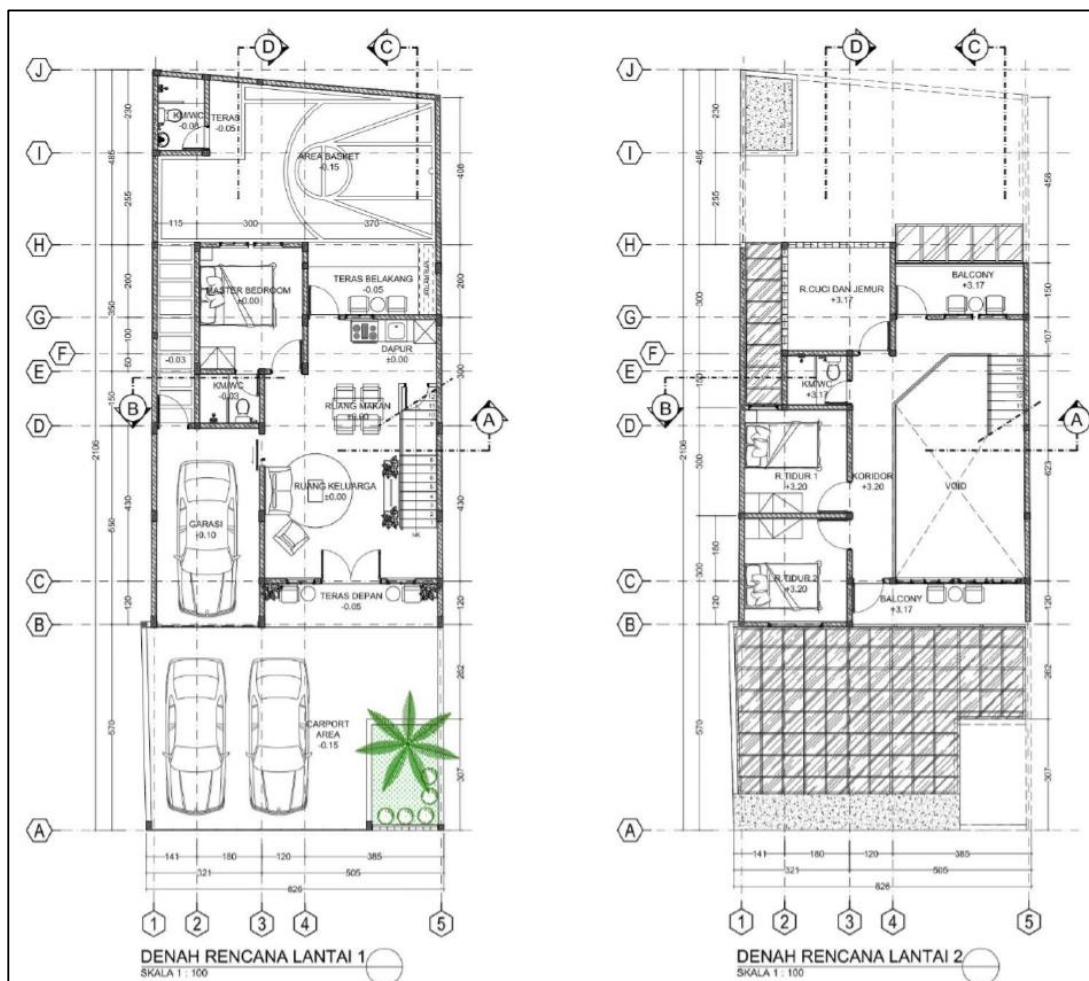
Example of an interior layout plan with Autodesk AutoCAD.
